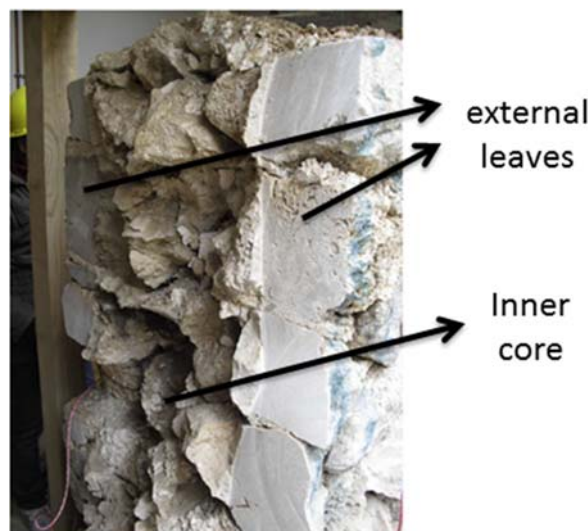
Cross section of a multi-leaf wall (Borri et al., 2011)
